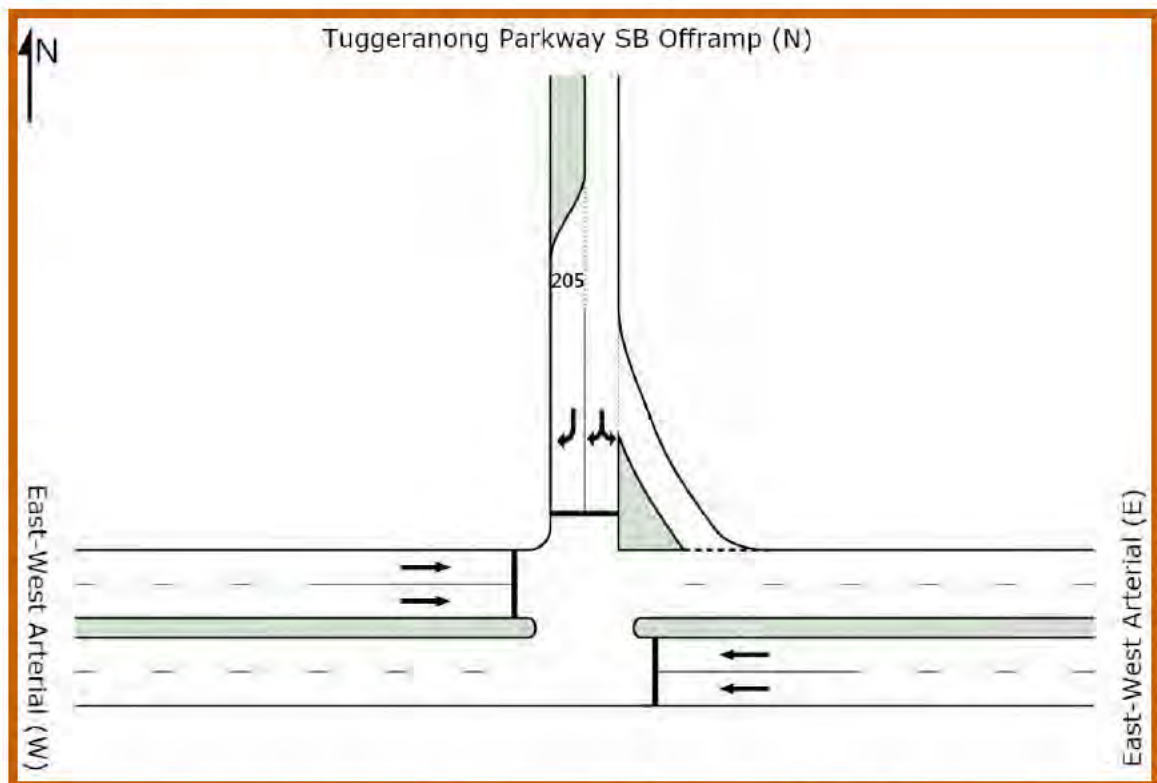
Intersection Layout of East-West Arterial – Tuggeranong Parkway Southbound Offramp (Tuggeranong Parkway North Facing Ramps 2031)
